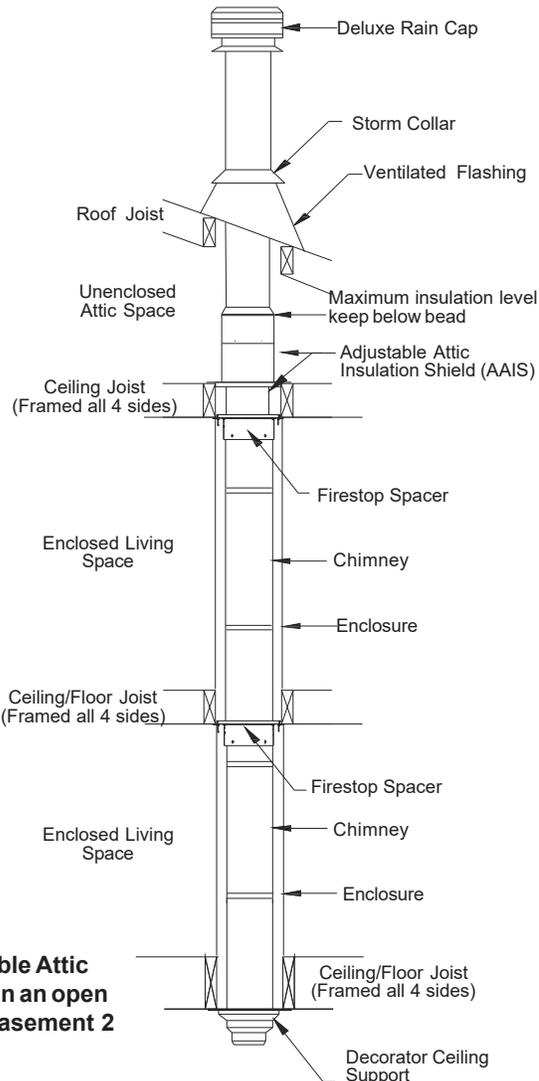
Adjustable Attic Insulation Shield in an open attic space of a basement 2 story installation
